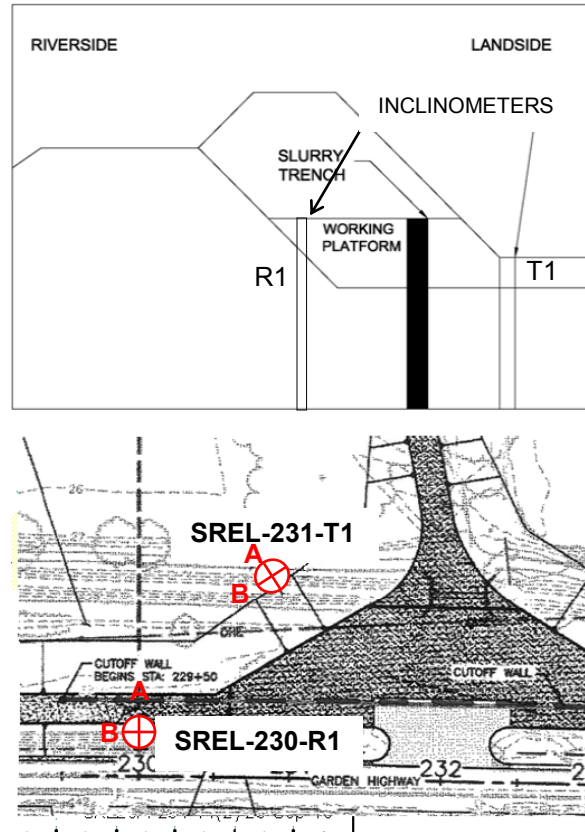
(a) Cross section showing inclinometers near Station 230+00. (b) Plan view showing inclinometers near Station 230+00
